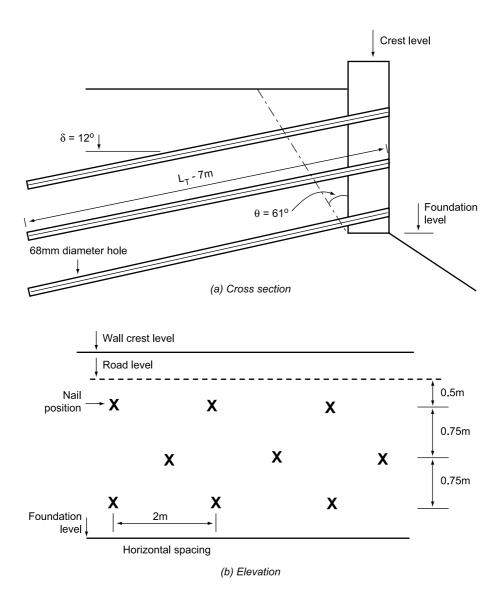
Soil nail layout for strengthening of existing wall - Scheme B
